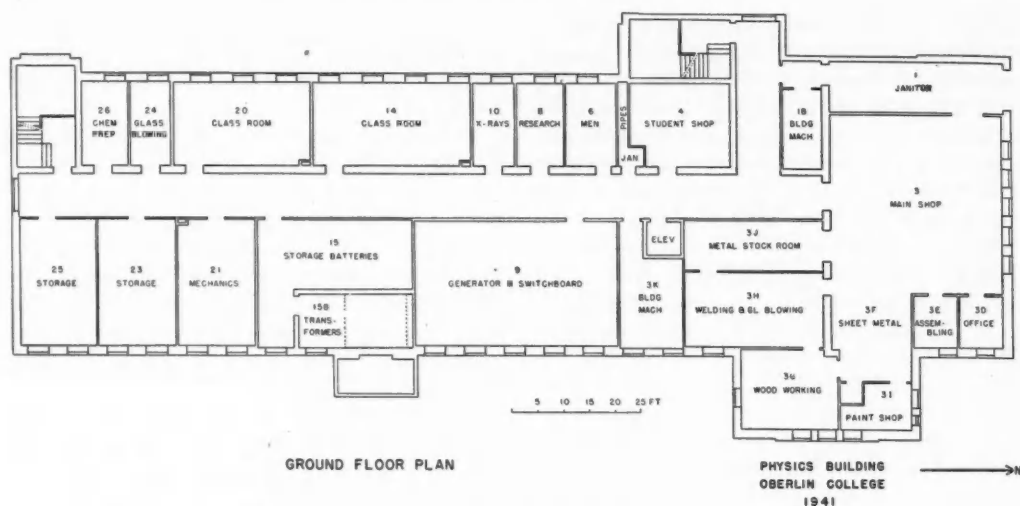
Ground floor plan of Oberlin College Physics Laboratory.
